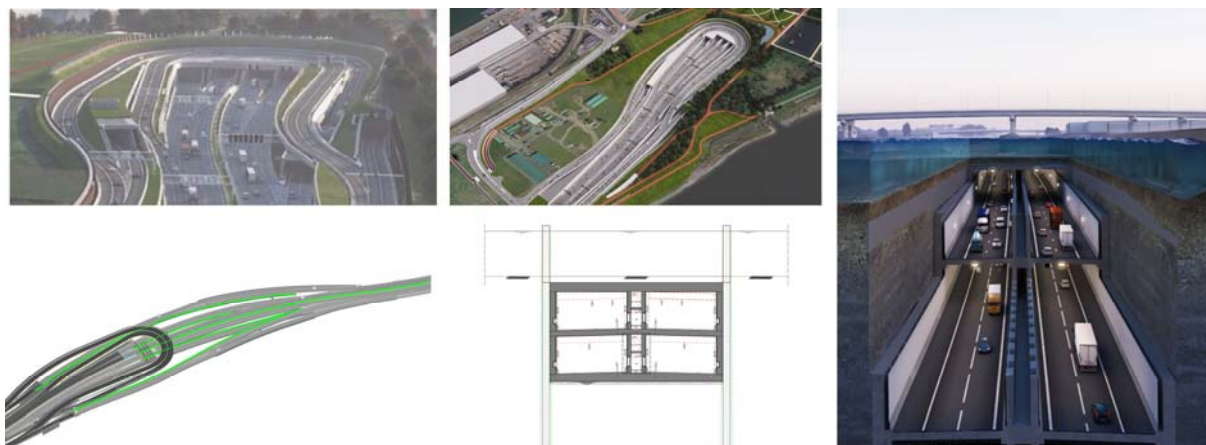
Top left: Tunnel portals of the Kanaalzone tunnels (tubes and ramps) at the Oosterweel junction; Top center: Top view of the Oosterweel junction; Bottom left: Schematic overview of Kanaalzone tubes, ramps and escape galleries; Bottom center: Cross section of stacked Kanaalzone tunnels; Right: Impression of stacked Kanaalzone tunnels.
